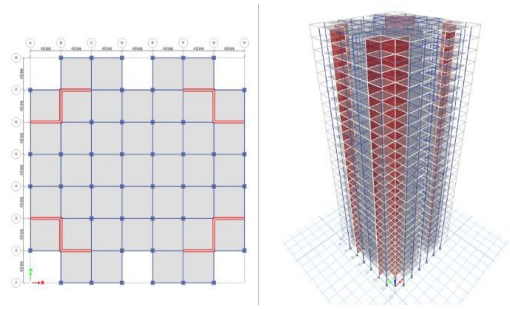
Plan of Structure Z- Shape shear Wall (Model2)
